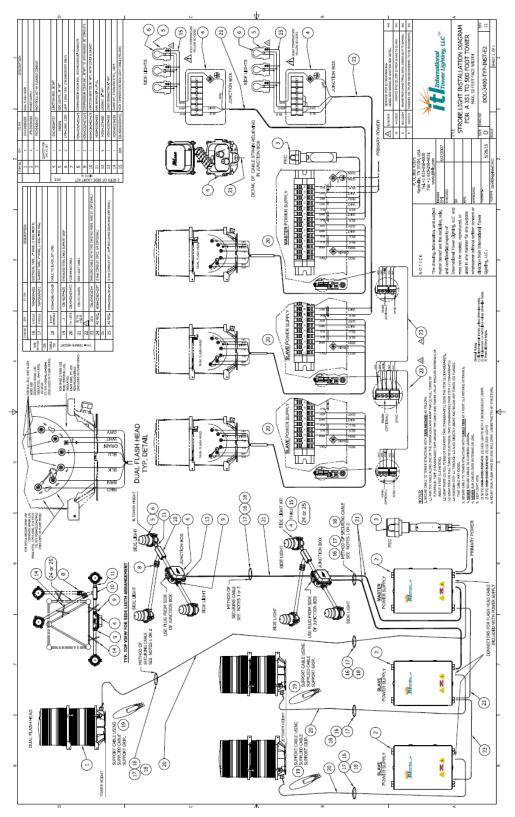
ILS-3400 Triple System Typical Installation Diagram – 500'
